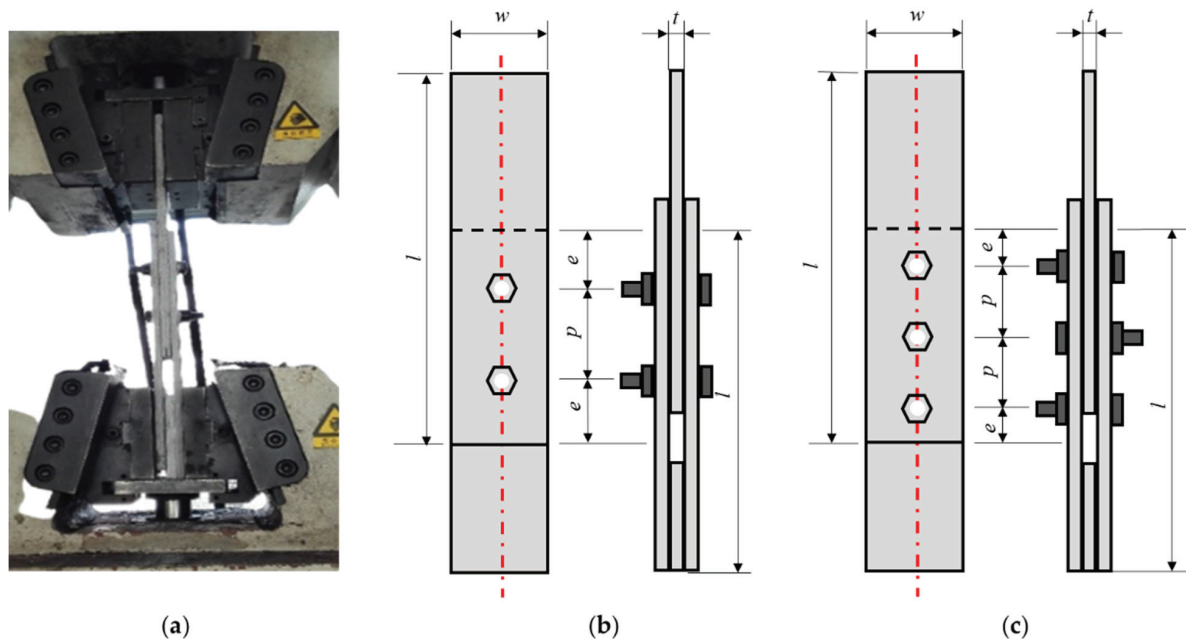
Double-lap shear test setup and geometric configuration of specimens: (a) actual photo, (b) specimen with two bolts, and (c) specimen with three bolts.
